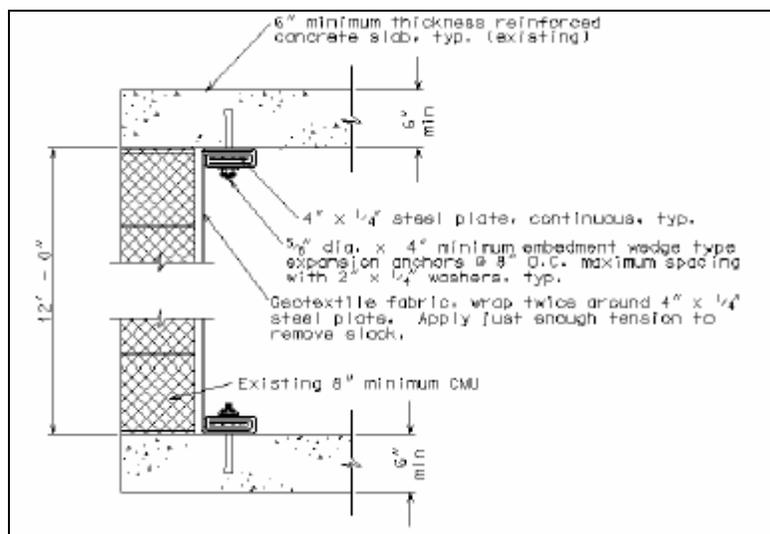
Cross section of geotextile fabric installation (ETL-1110-3-494).
